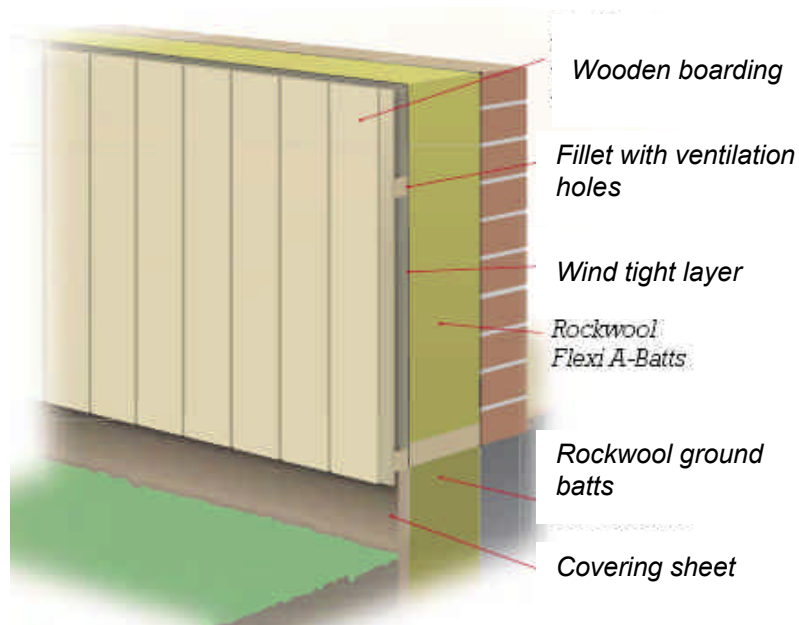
Wind tight layer at external wall for building renovation from out side.
